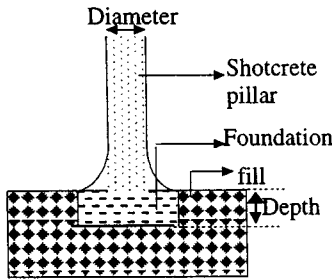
Model configuration for shotcrete pillar erected on cemented rockfill.
